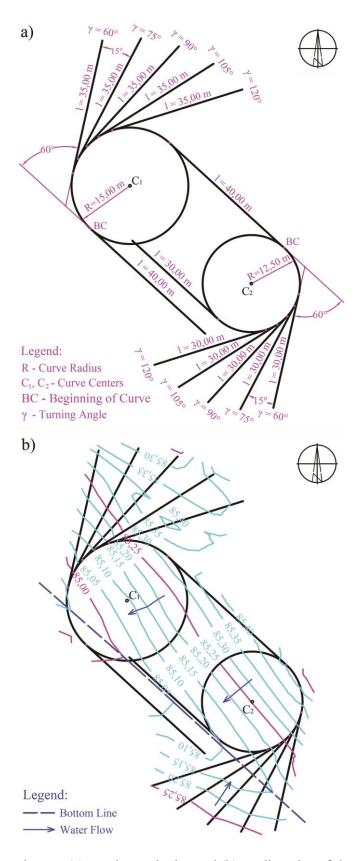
Test polygon layout: (a) steering path plan and (b) grading plan of the pavement surface.
